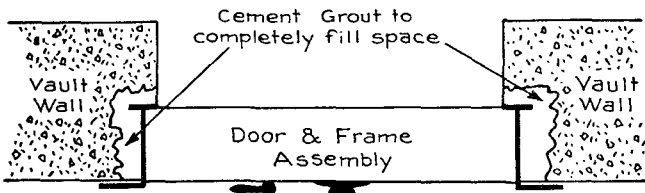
Installation when Vestibule Does Not Lap Both Faces of Wall.
